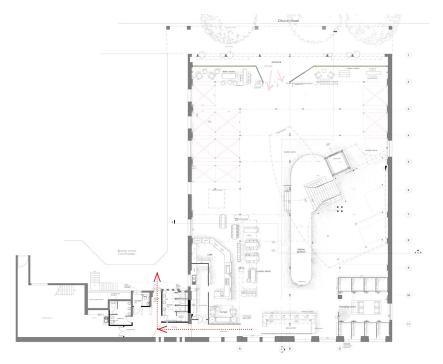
Ground floor fire exit route-not to scale (Author 2013)
